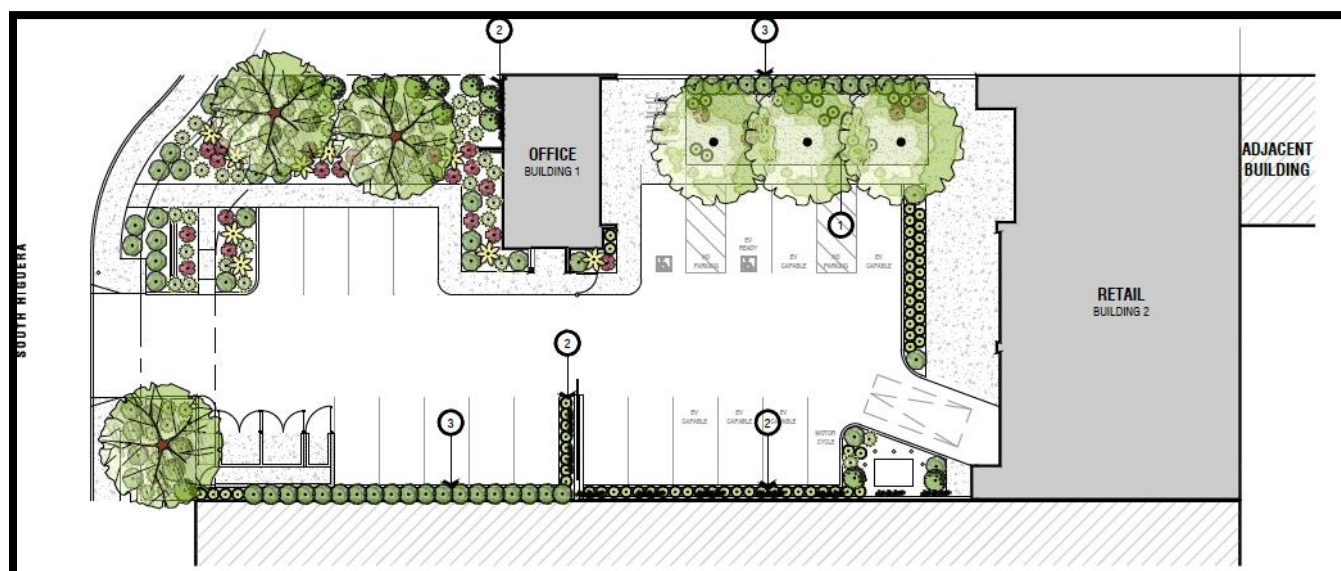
Phase Two Site Plan (Ten Over Studio 2021)
